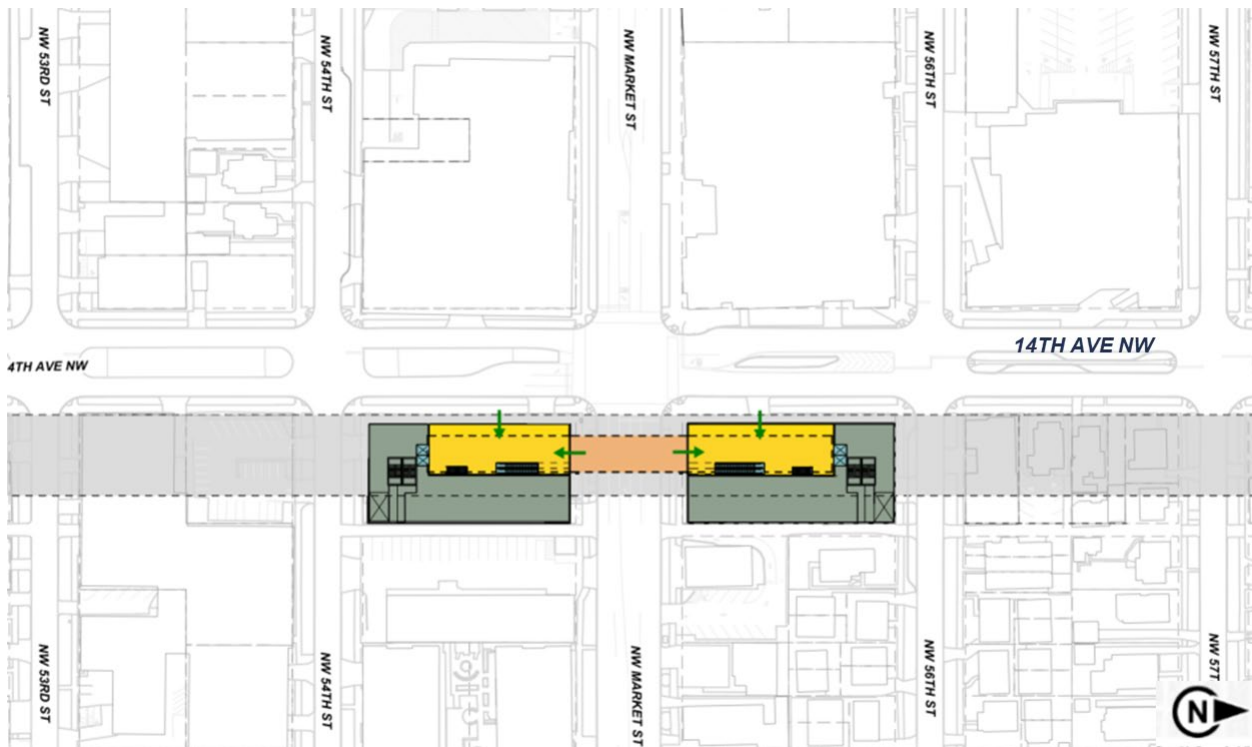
Shifted Tunnel 14th Avenue Station Plan
